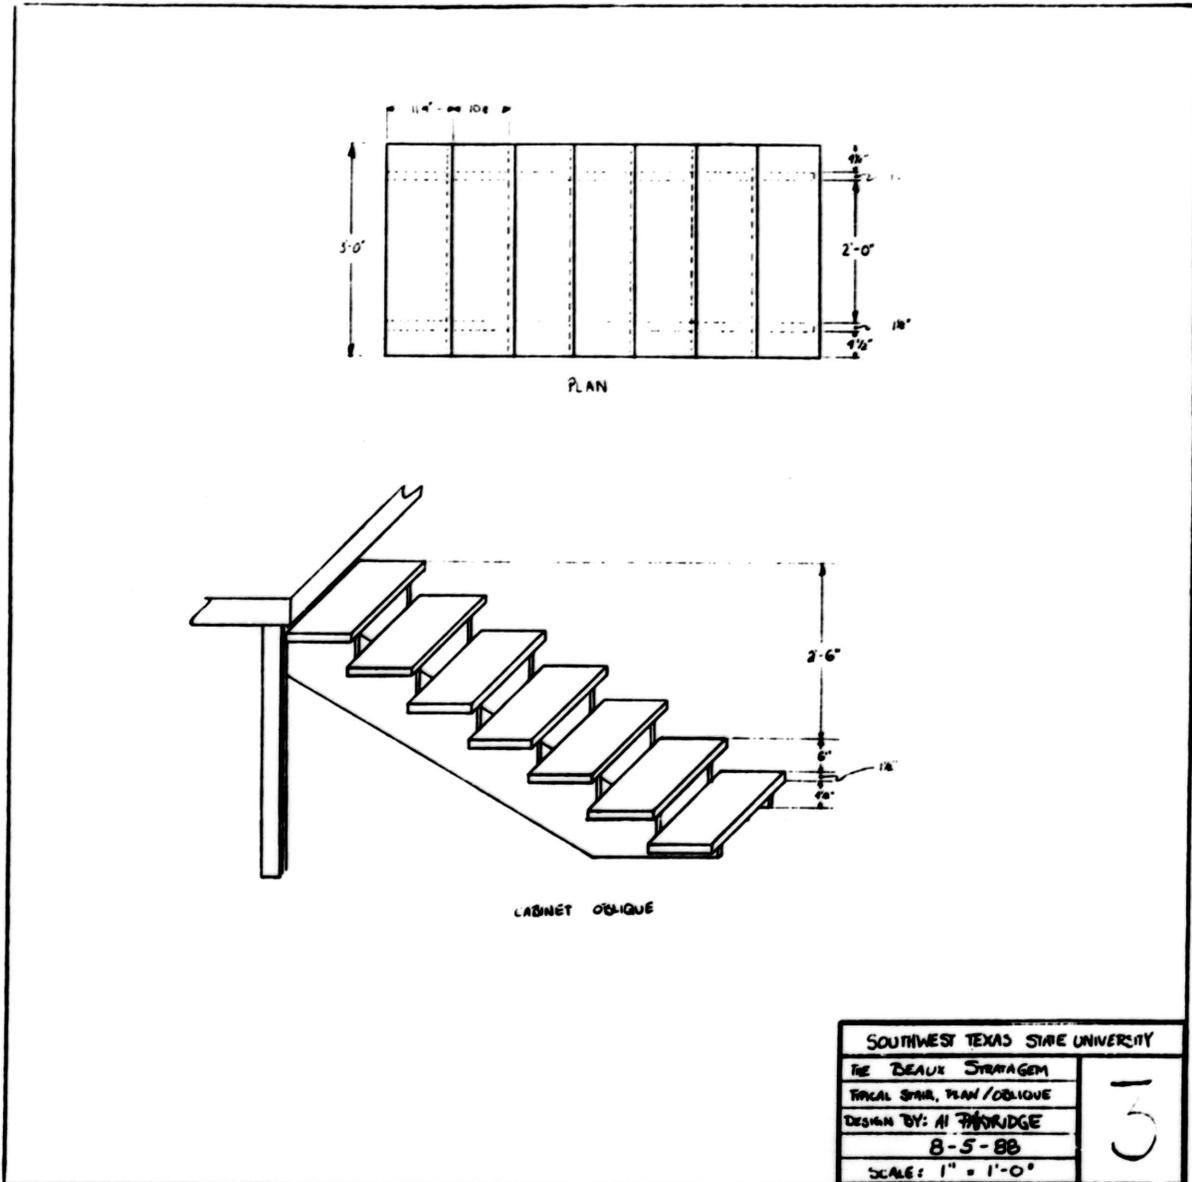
Plate 3, Typical Stair, Plan/Oblique.
